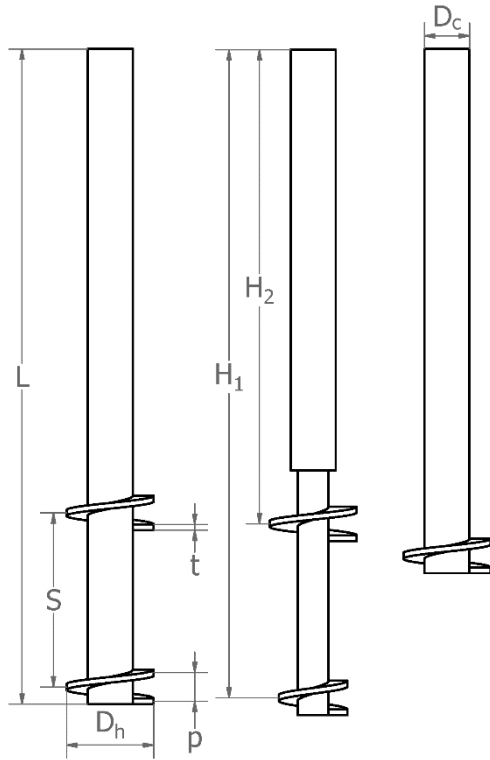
Screw pile designs used in centrifuge tests. Left: uniform double-helix, middle: optimised double-helix, right: uniform single helix. See Table 3 for description of symbols and dimensions.
